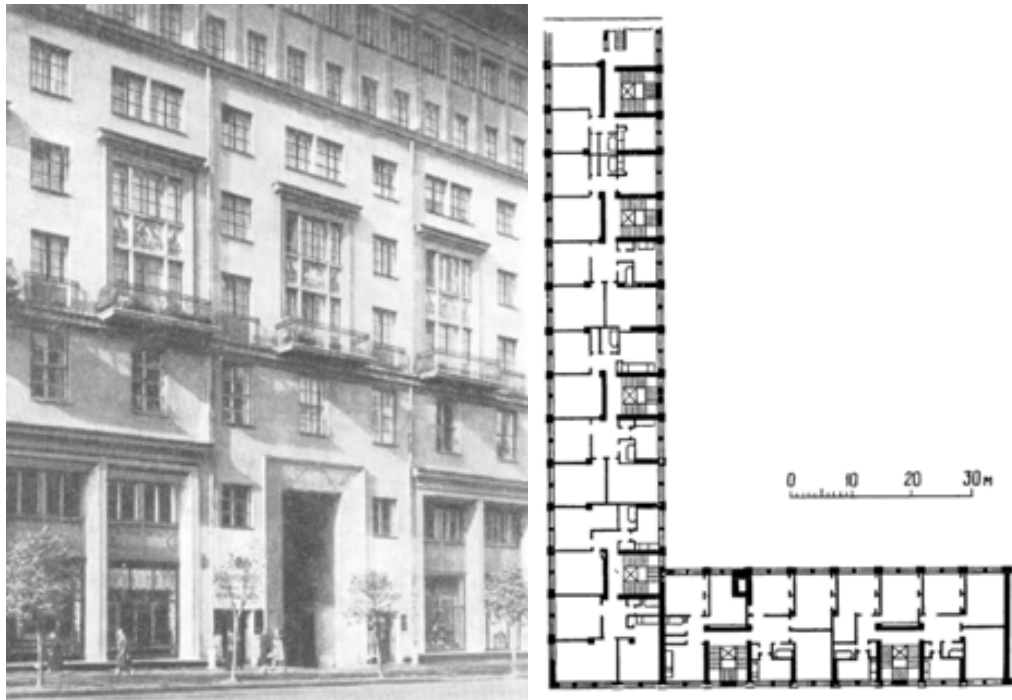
Moscow. Residential building on Gorky Street. Architect: A. Burov. 1933-1949, Fragment of the facade and plan
